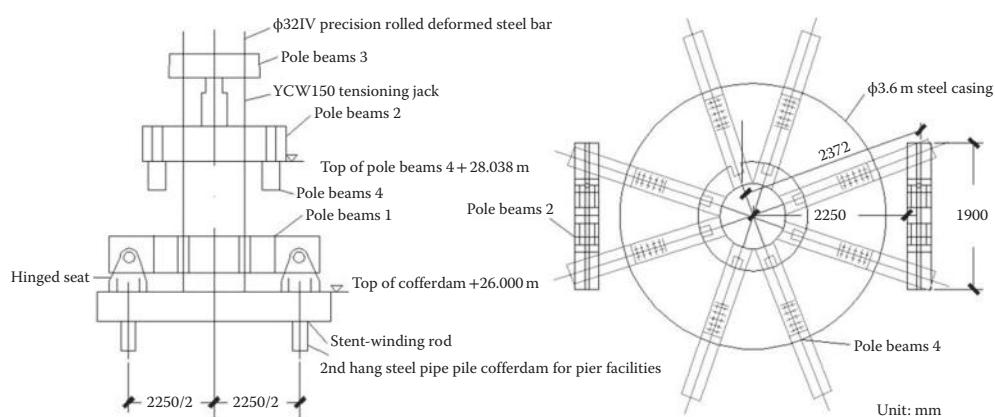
Fixtures of steel pipe piles. (From Li, J.T., & Qin, S.Q., *World Bridges*, 2, 17–19.)
